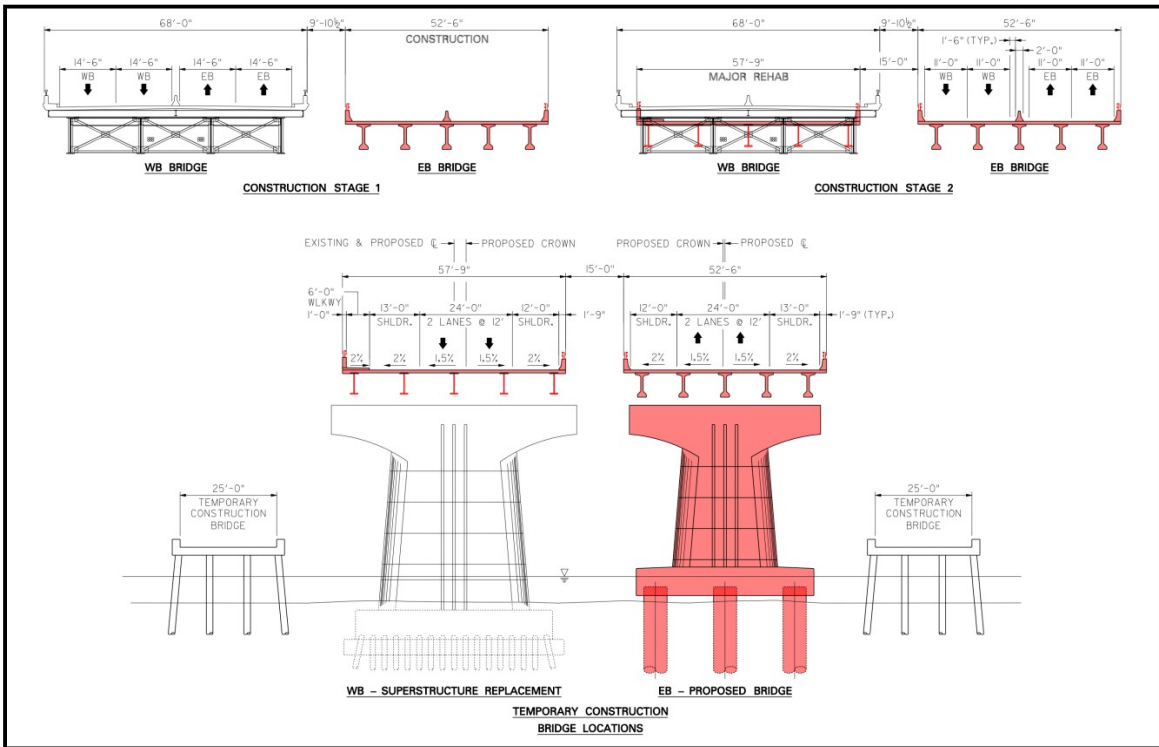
Bay Bridge Construction Staging (Alternative 2 – Replacement)
